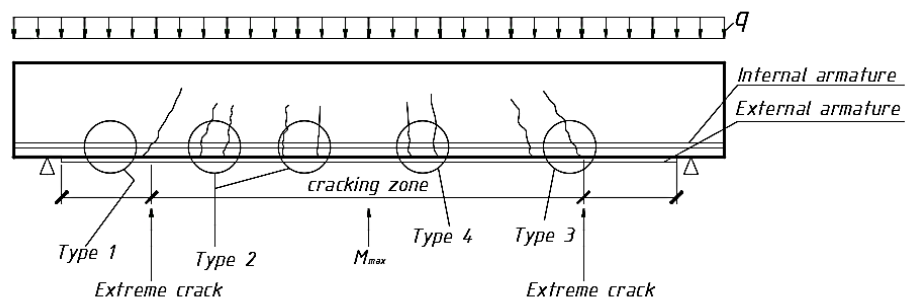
Types of destruction of a reinforced concrete structure reinforced with a composite strip
